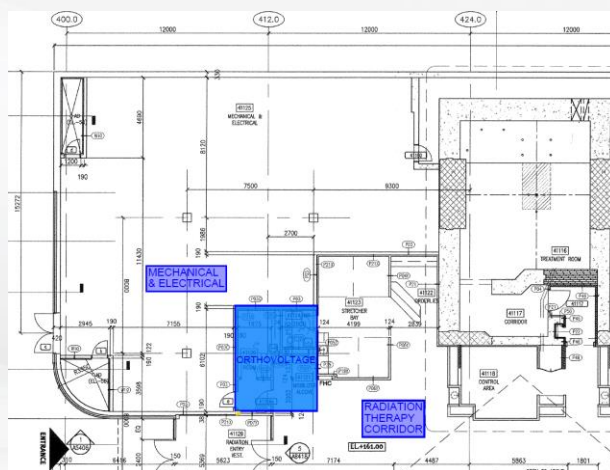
Layout showing a horizontal section of the HDR treatment room,
